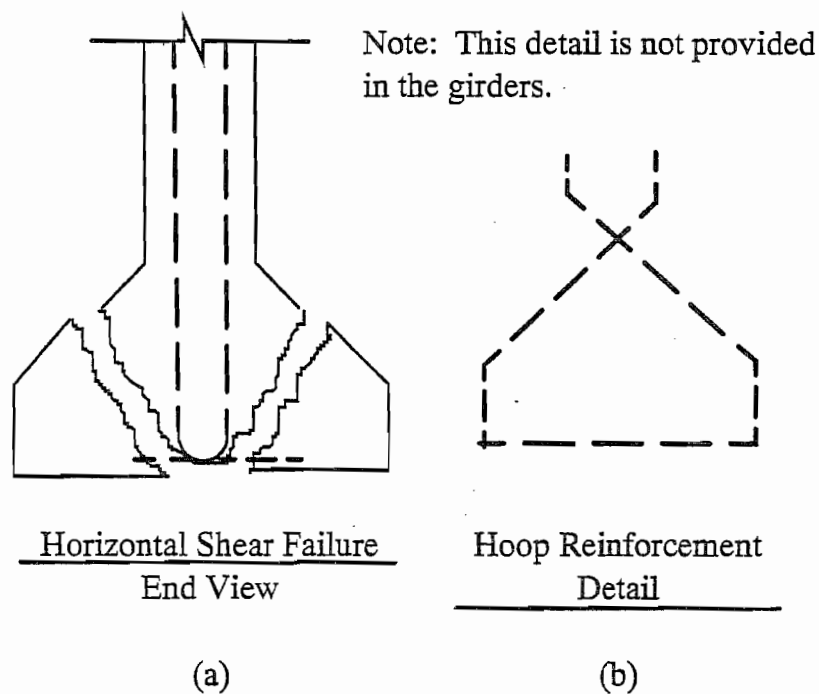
Horizontal Shear Failure, Girder DZ2450-2
